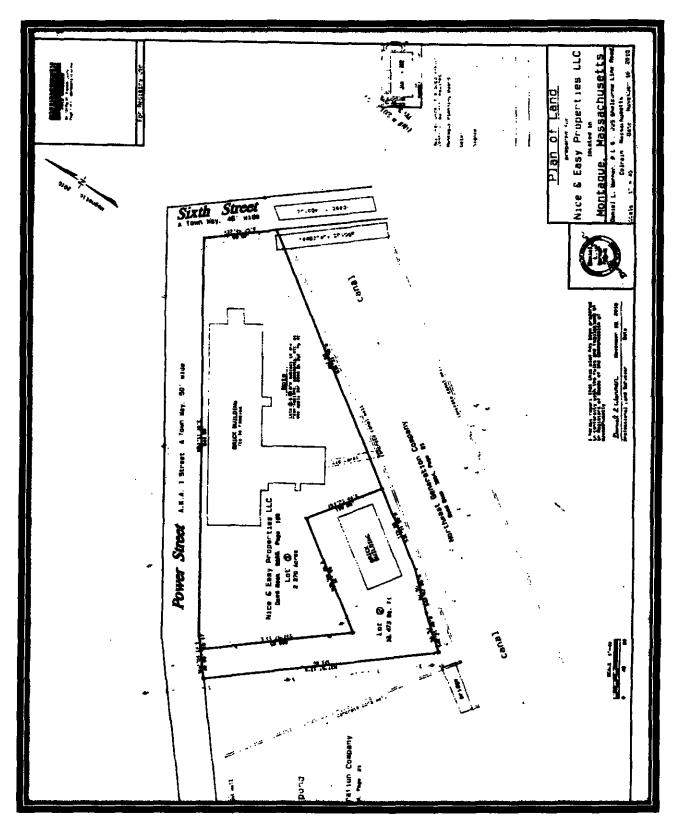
Subdivision Plan for 11-15 Power Street Property
